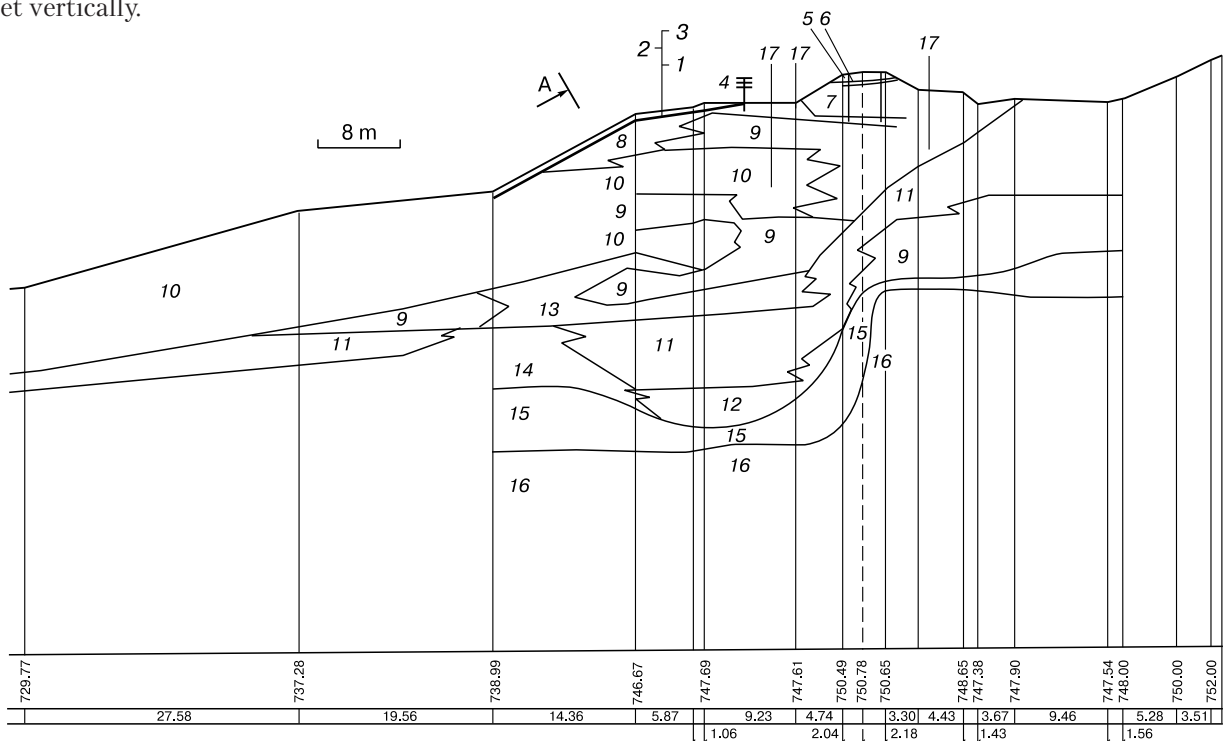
Cross section of subgrade on a hillside slope at the 1374th km of the Baikal-Amur Railway stabilized with long thermosyphons and plastic foam insulation.
